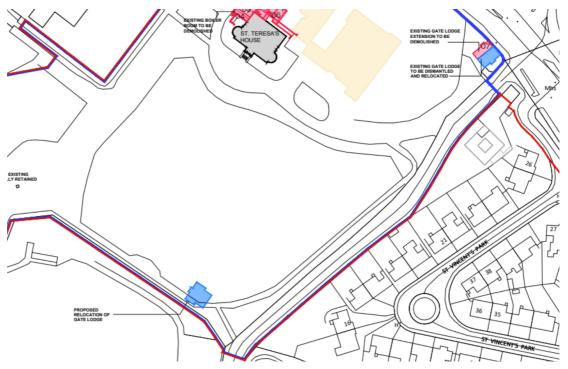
Site Plan of Gatelodge Relocation Proposal
